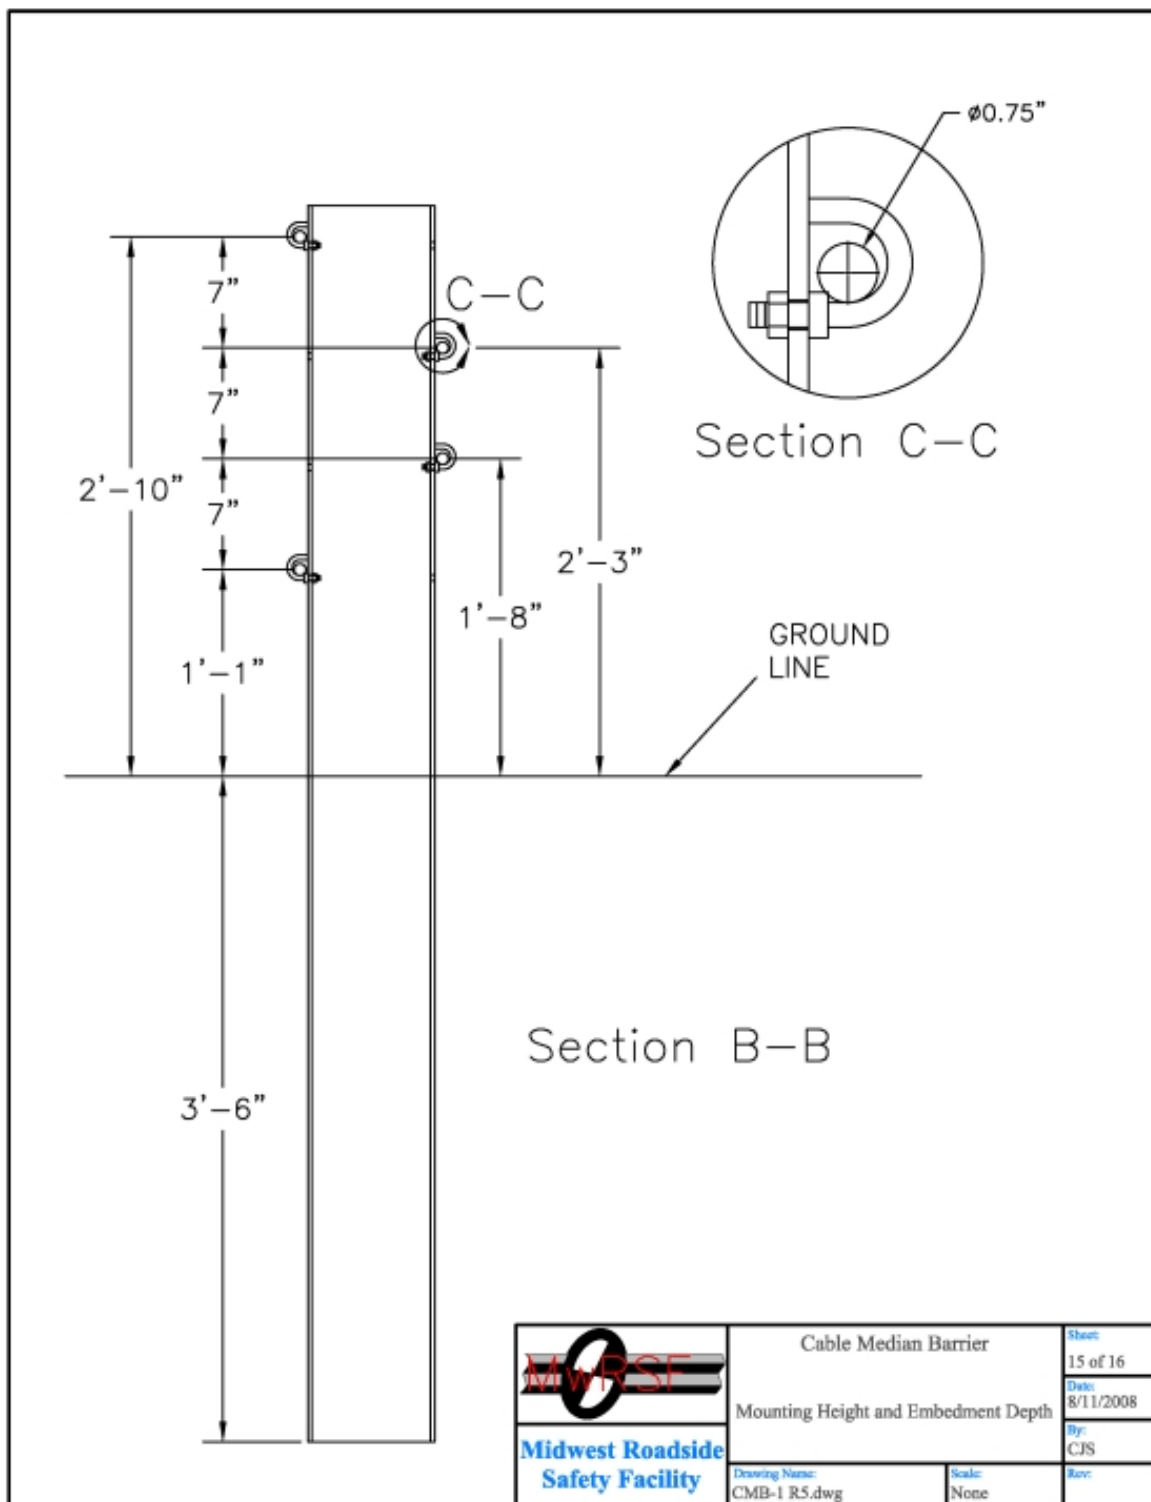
Cable Guardrail Post Assembly (English), Design No. 1
